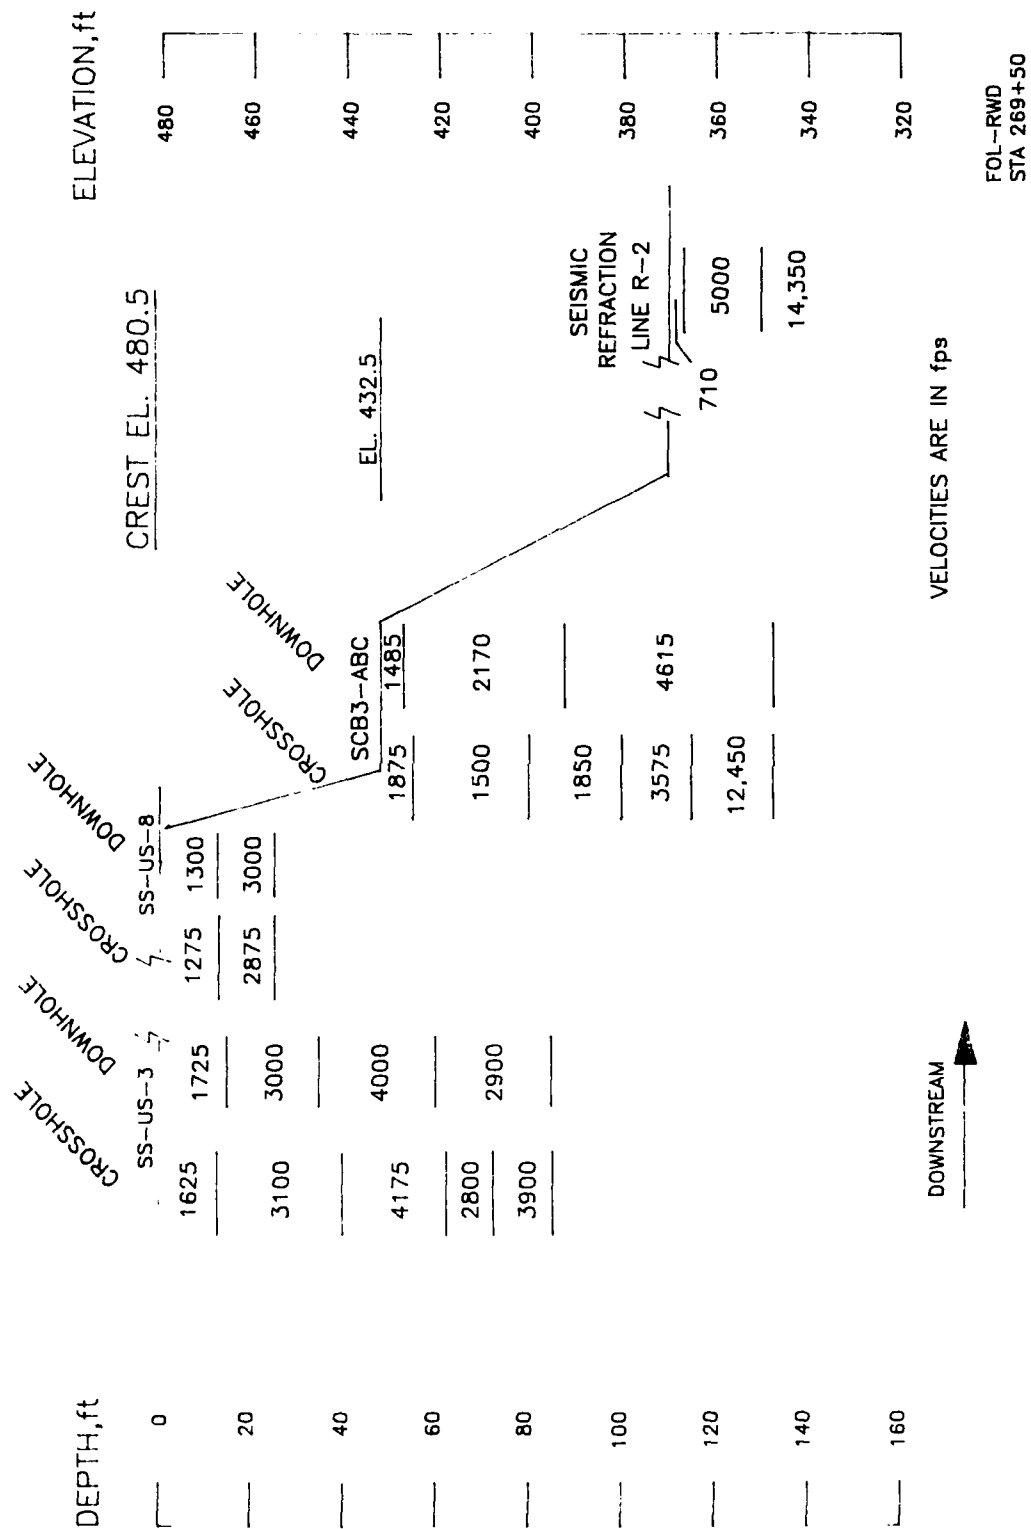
P-wave composite for cross section through Station 269+50 Right Wing Dam
